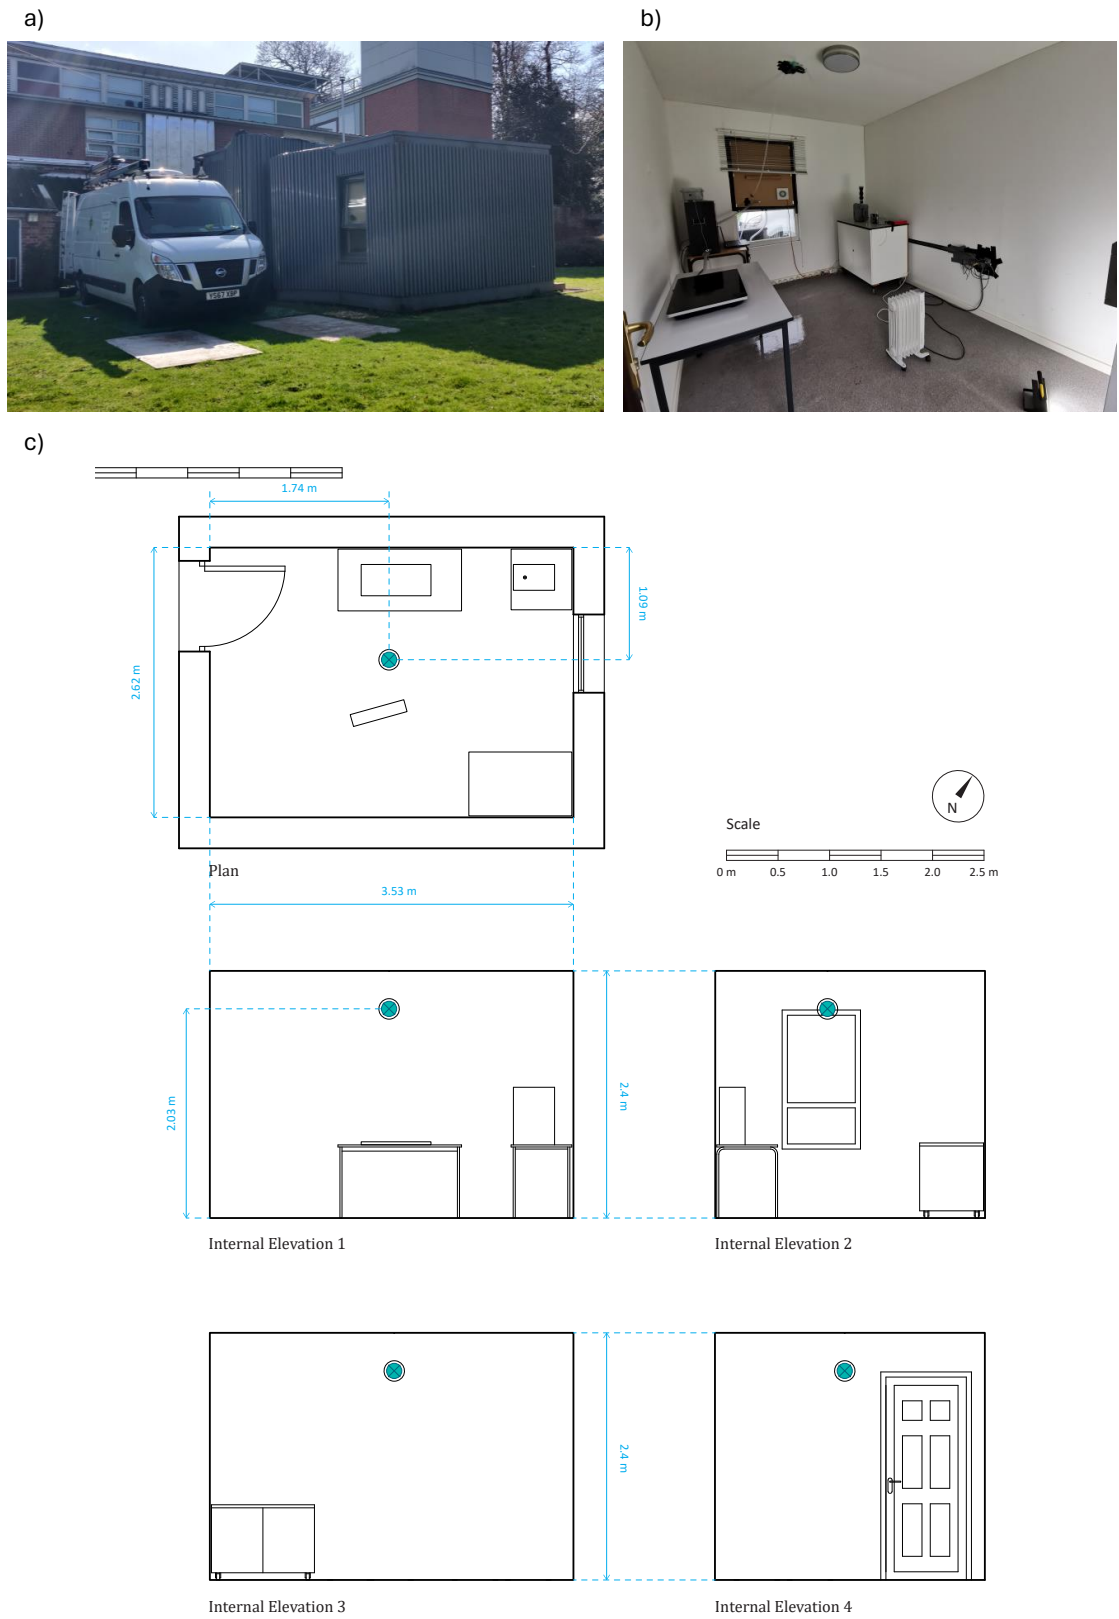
a) External view of Part L (test) pod and Wasp, b) Internal view of test pod, c) Floor plan and internal elevations of test pod. Sampling location denoted by blue circle.
